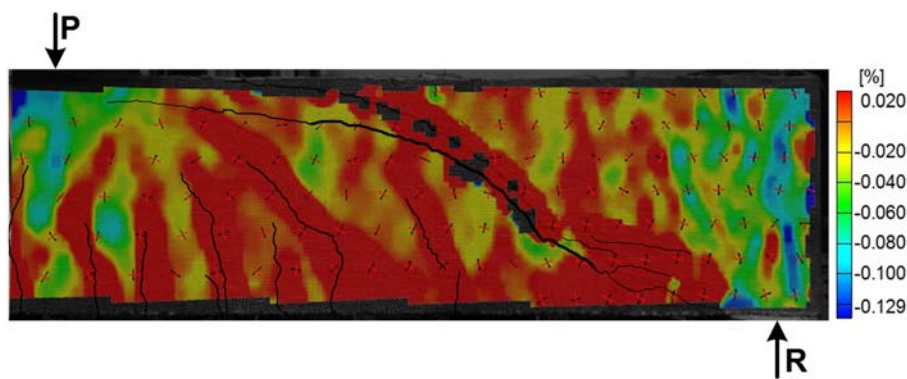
Scaled full-field concrete longitudinal strain ( $\epsilon_x$ ) across shear span for specimen RC18b after failure
